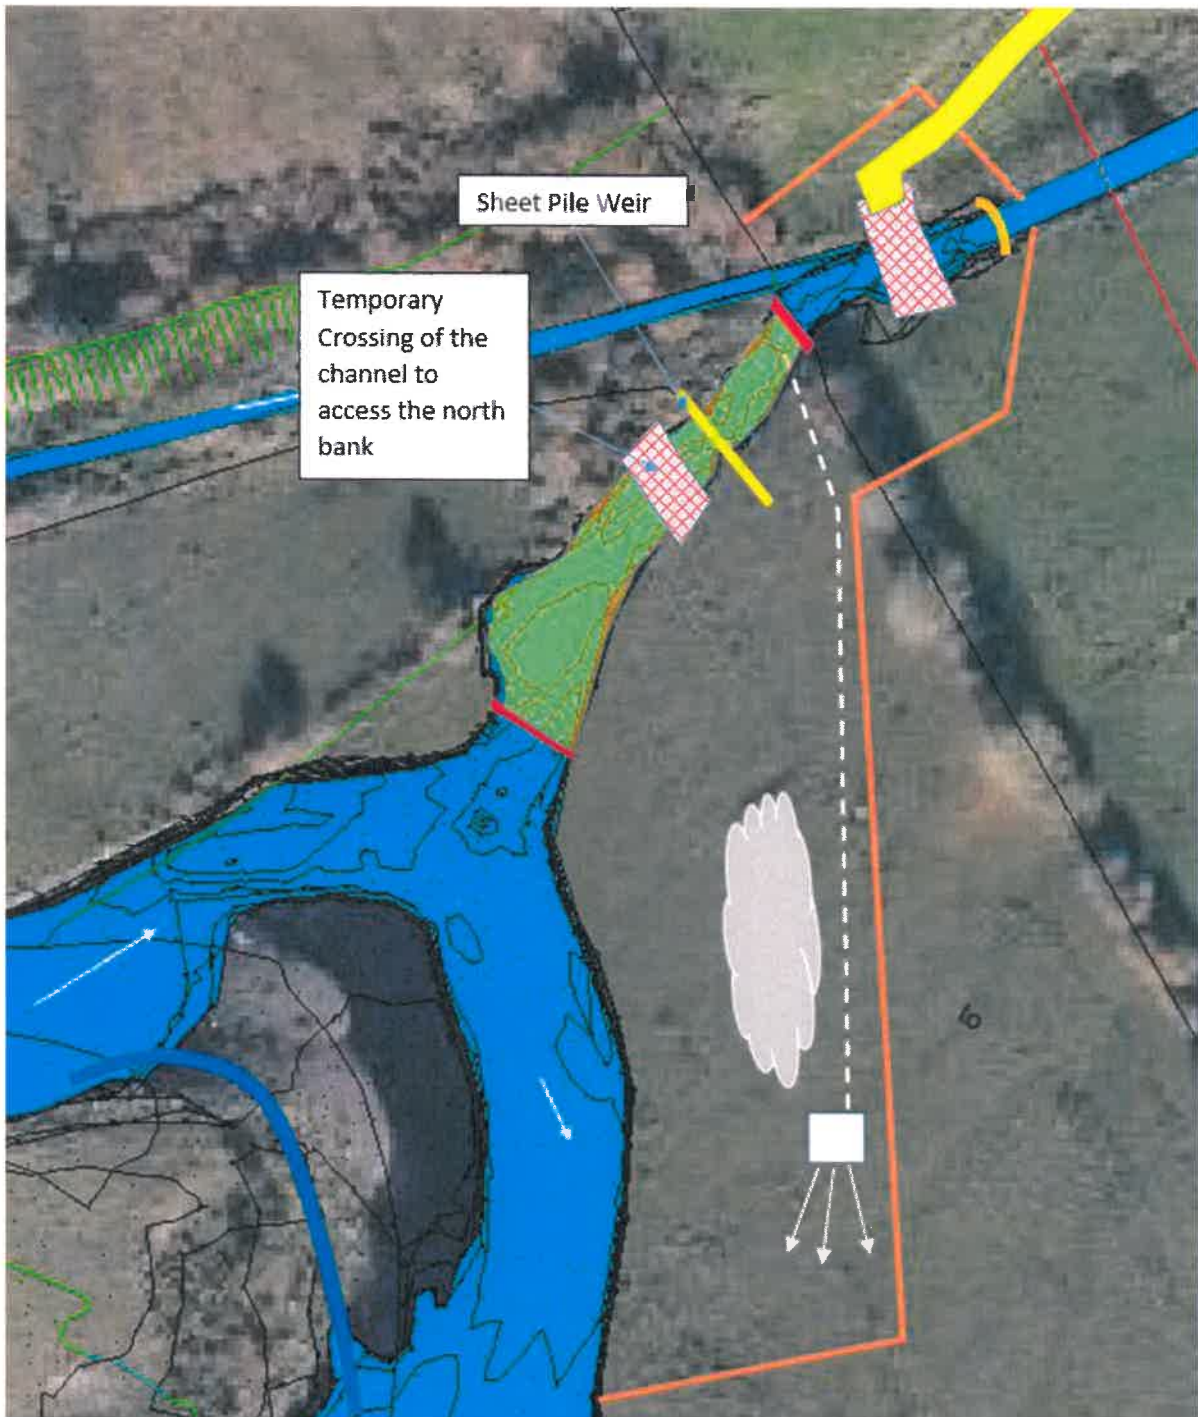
STEP 6 Install temporary crossing of the channel upstream of the proposed weir site using rip-rap to facilitate passage from south to north bank (left bank) of the breach, Carry out clearance works on north bank, Install sheet piles from the north bank southwards, crossing the channel and continuing into the south bank of the breach channel as per the design details, Cut off the sheet piles to required levels, Install capping to the exposed sheet piles.
